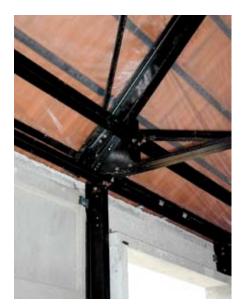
Maison Phénix during construction, showing the roof details for a single storey house
